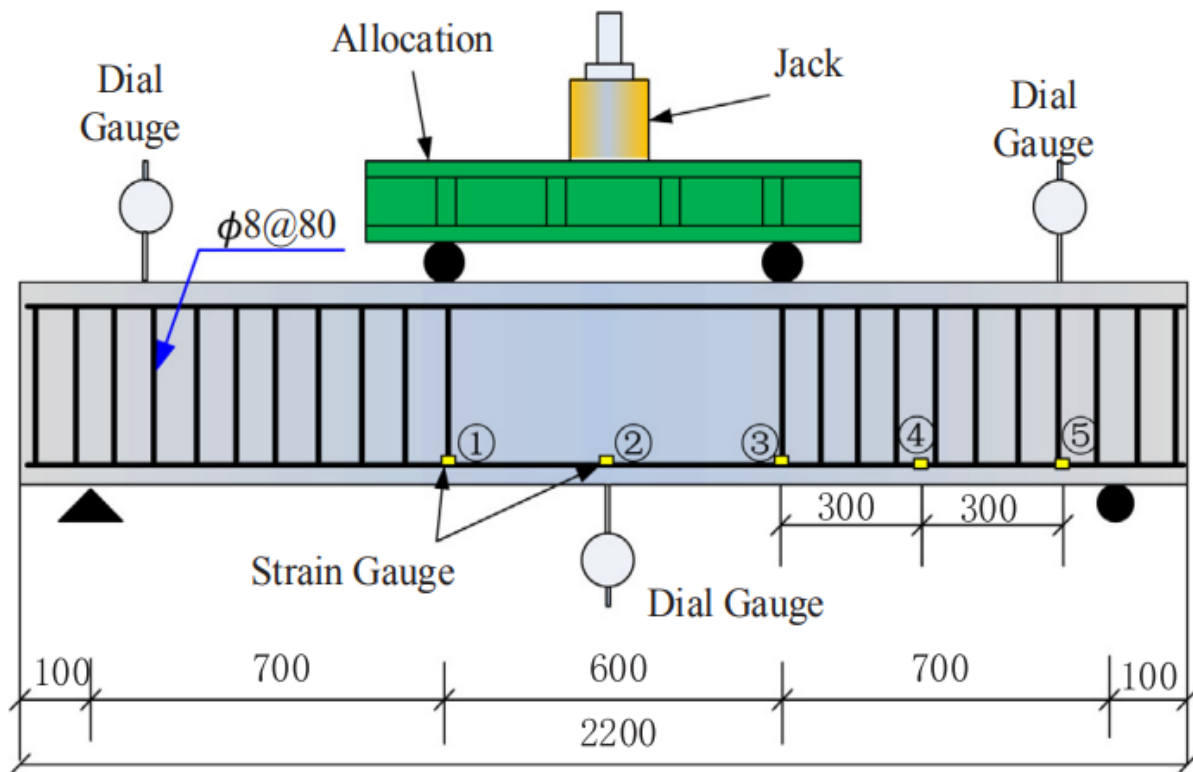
Geometry, reinforcement, and cross-section details of beam specimens (dimensions in mm). [Karayannis et al., 2018]
